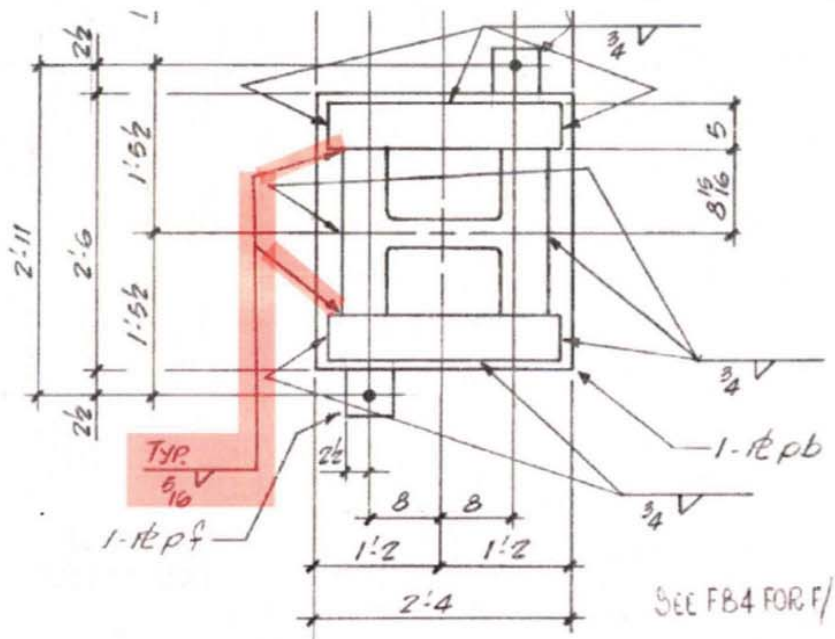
Excerpt from Frankel Steel Shop Drawing #59 Showing Column 79 Detail
